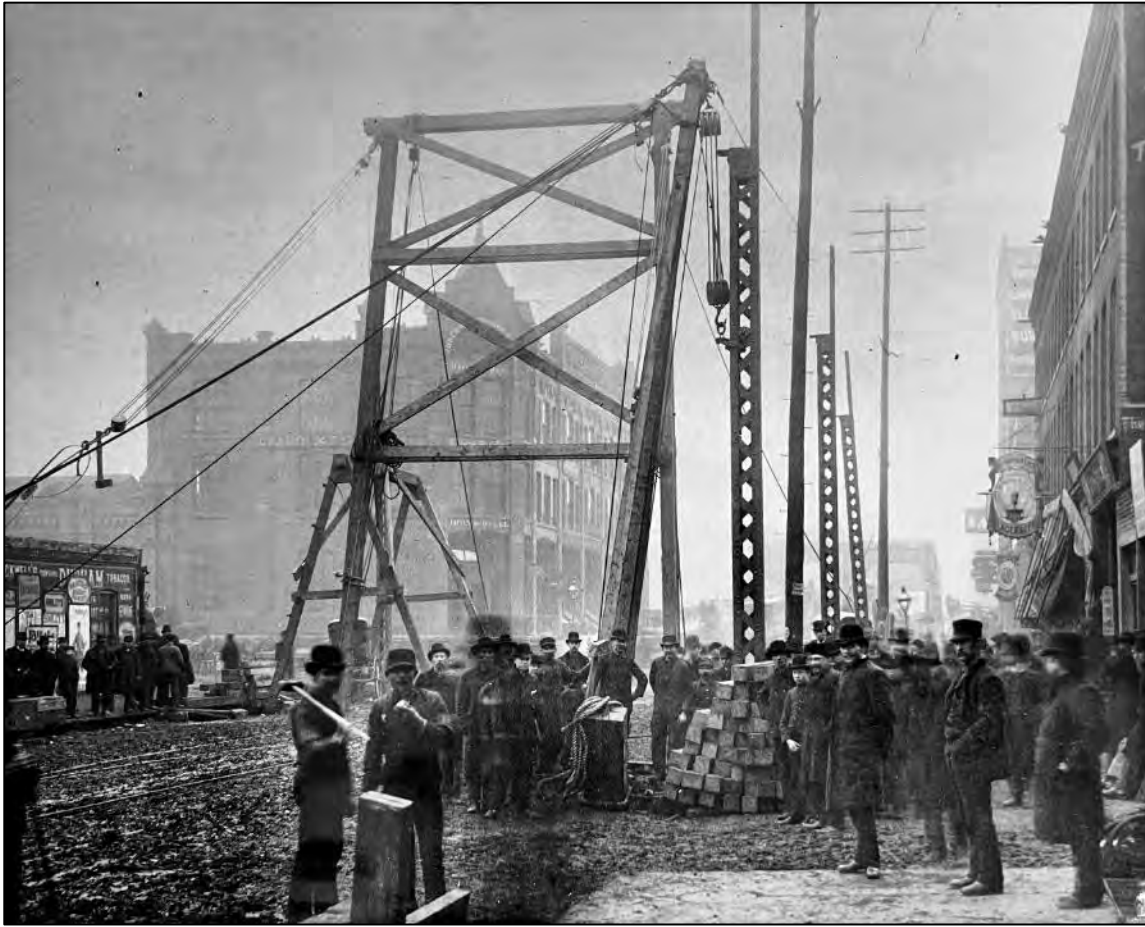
Beginning the erection of the Lake Street L columns at the northeast corner of W. Lake and N. Milwaukee Avenue, 1892. Collection of George Krambles. CTA Photo H290.
